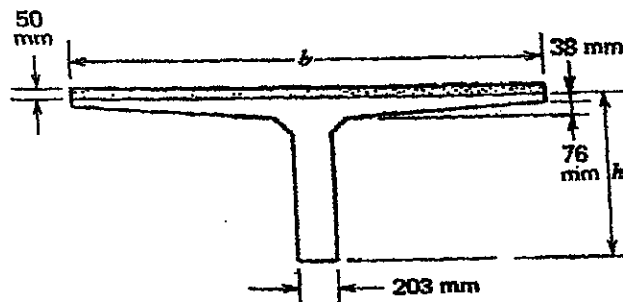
(a). Typical single-tee section (Lin Tee).
